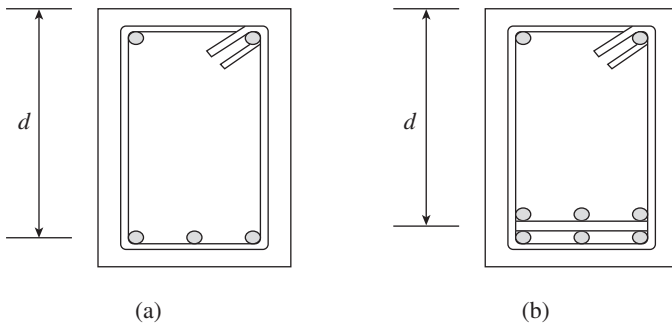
Effective depth of an RC beam (a) Beam with single layer of reinforcement (b) Beam with two layers of reinforcement
